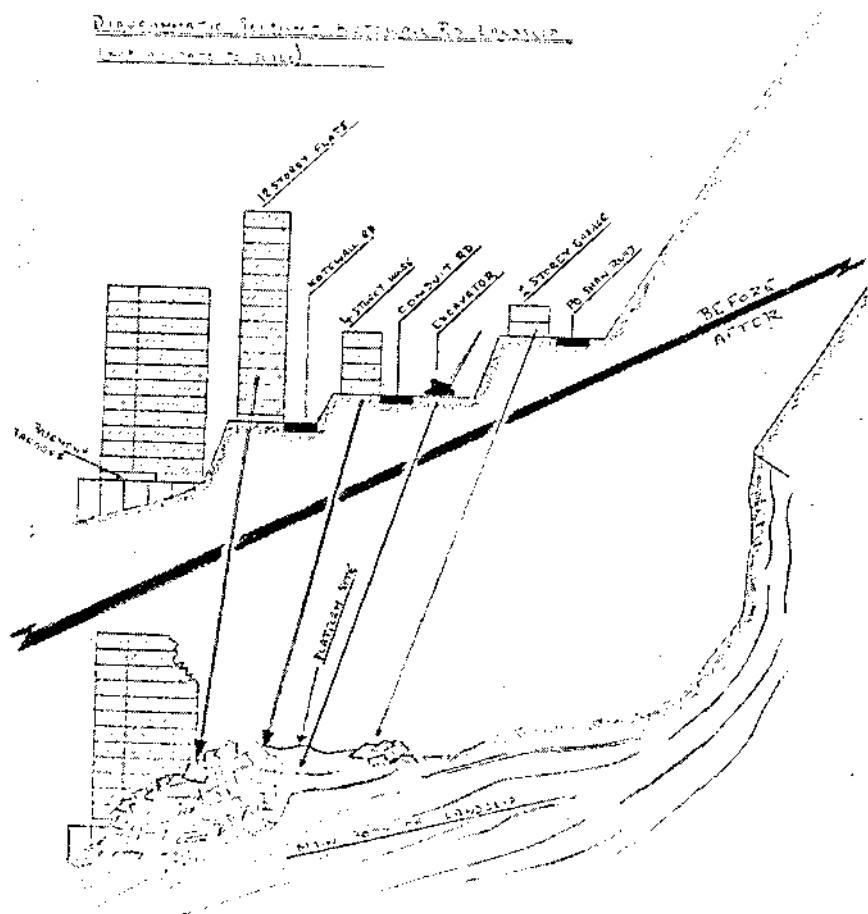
Diagrammatic Section—Kotewall Road Landslip.
